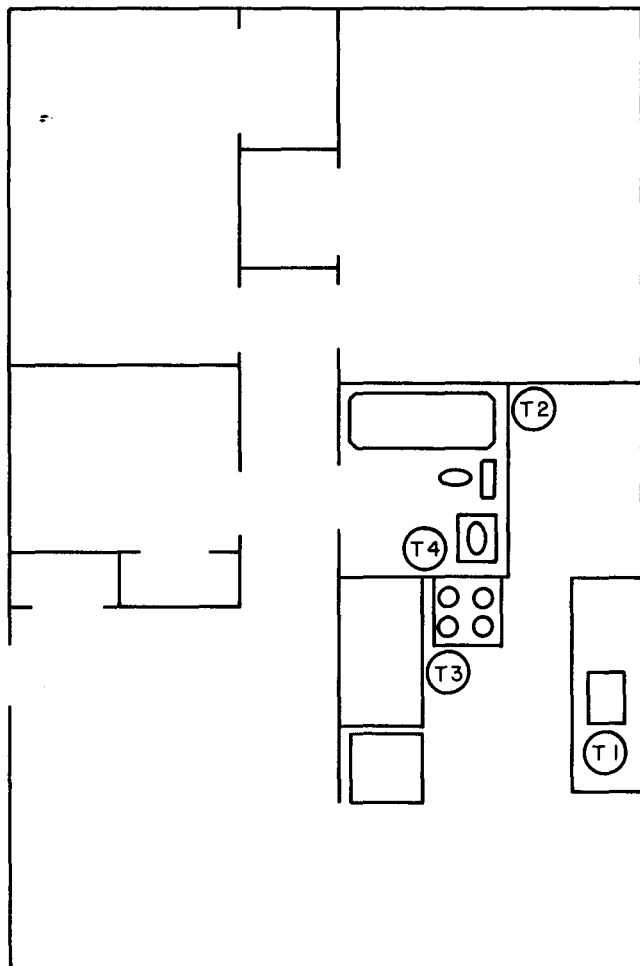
Floor plan of a typical set of quarters showing cockroach trap locations (see fig 3-3).
